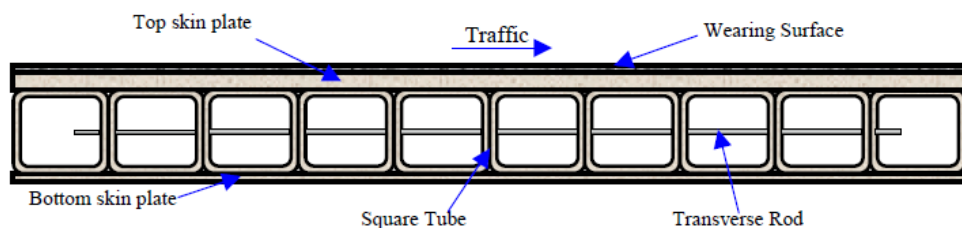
Cross-section of Strongwell deck system (Zhou *et al.*)
